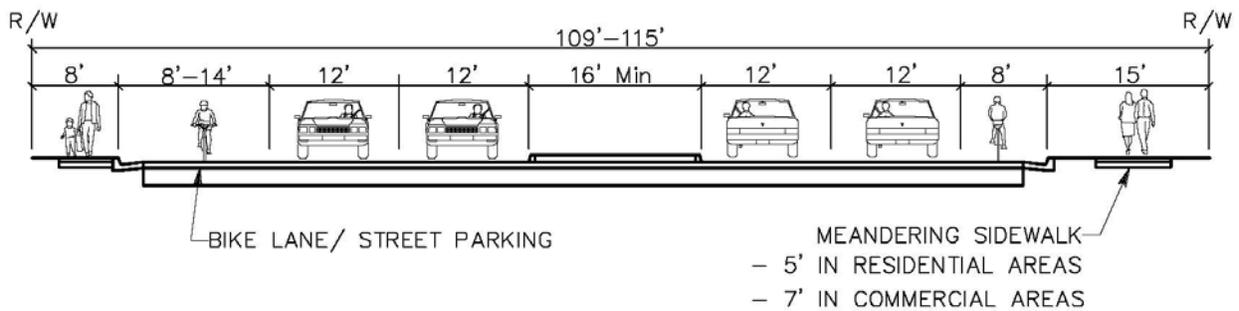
Segment 3 - Ultimate Roadway with Bicycle Lanes and Street Parking On North (Looking East)
